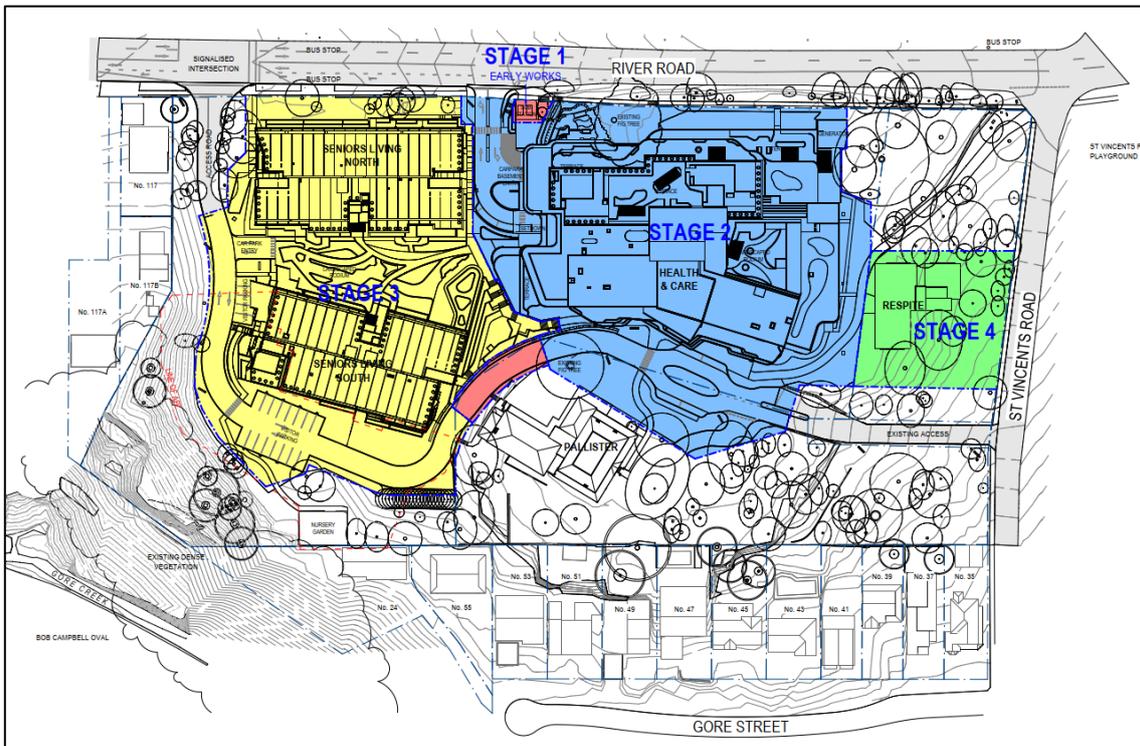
Proposed Staging Plan (Bickerton Masters, Drawing No. AR-SW-0120, Rev.P11, 08/07/2024)
